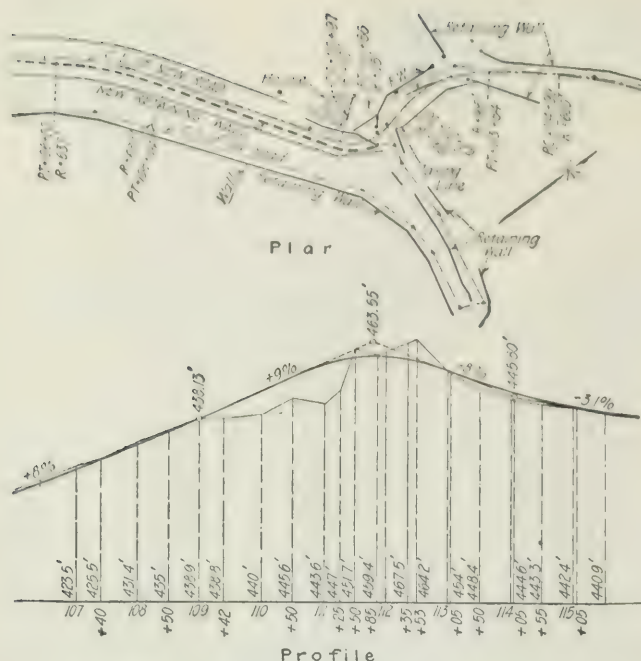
PLAN OF RELOCATION OF NYACK-ROCKLAND LAKE ROAD AT STA. 112
